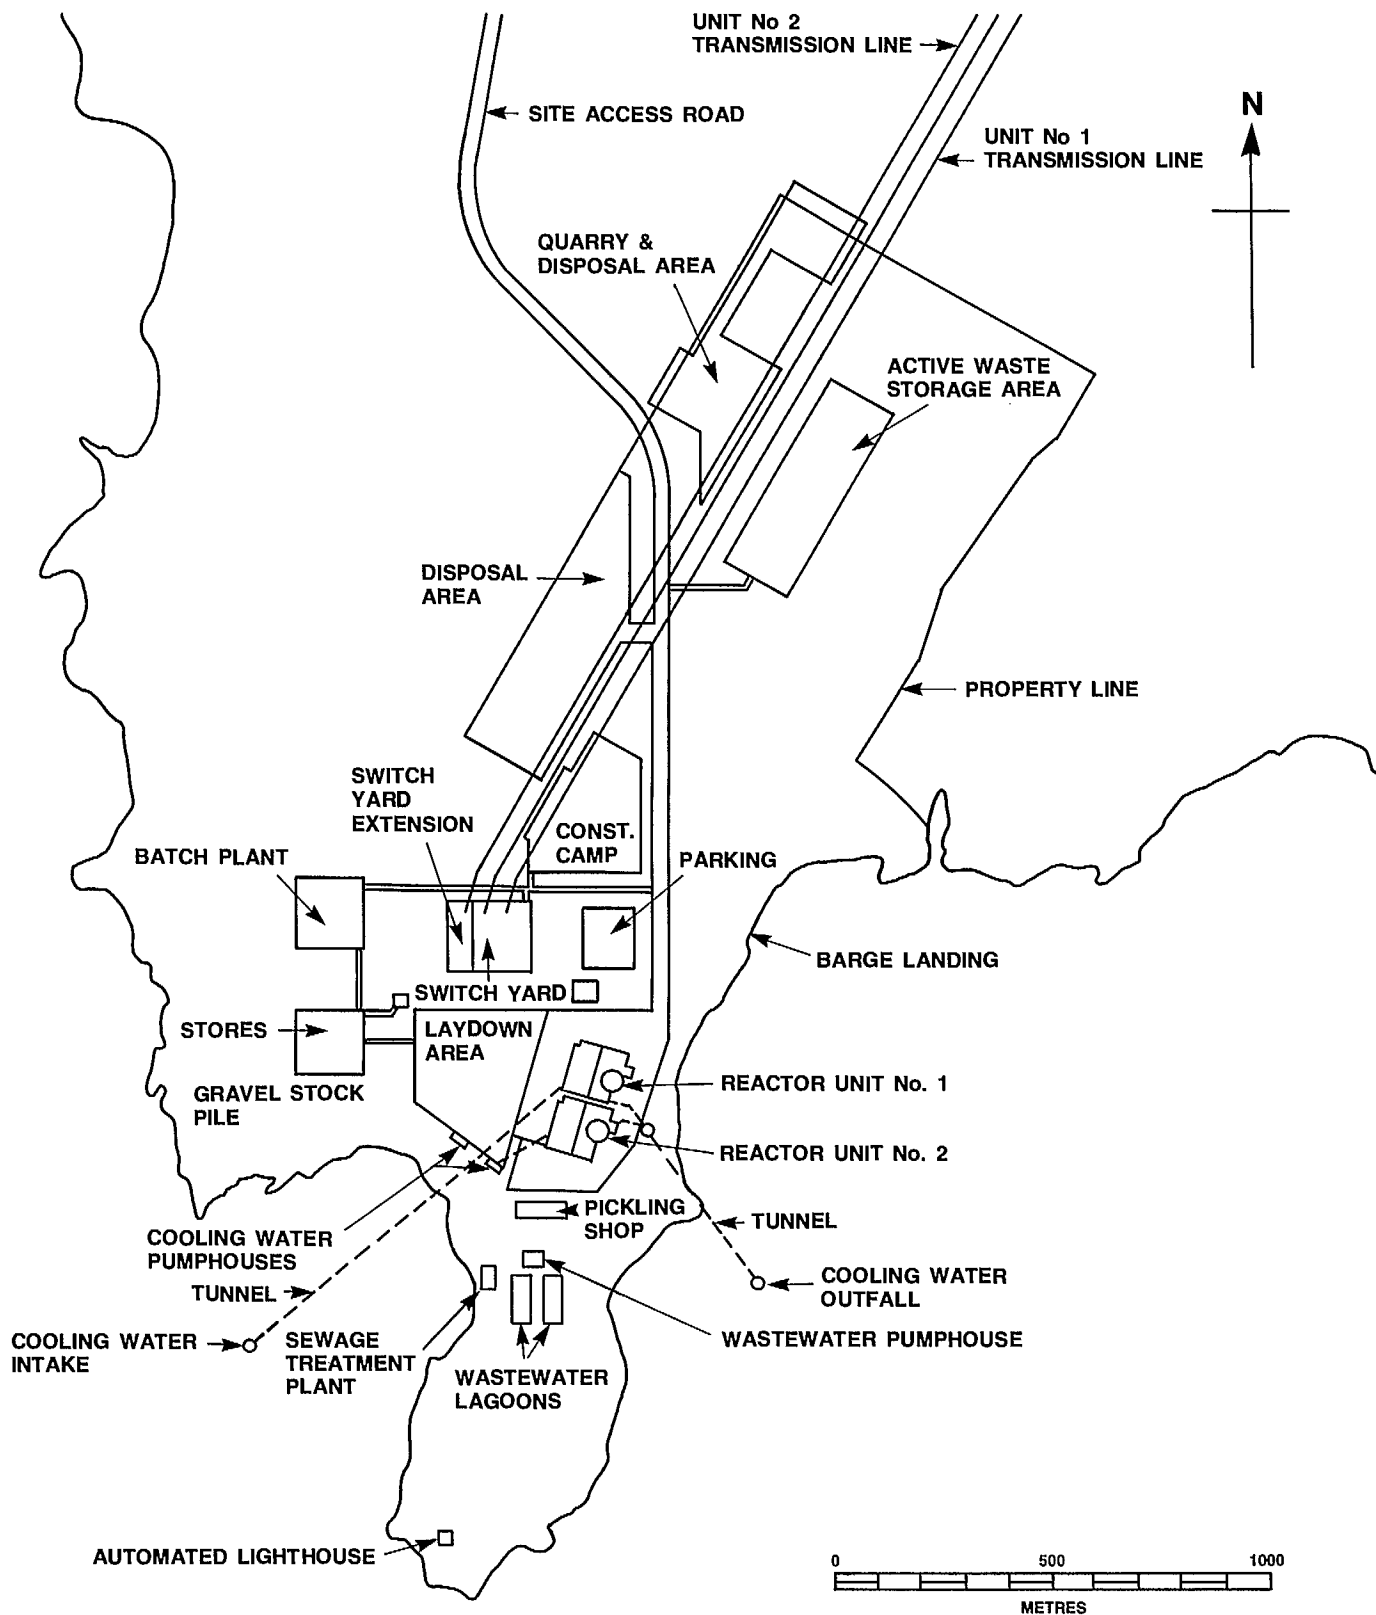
TYPICAL SITE PLAN FOR A NUCLEAR POWER STATION
